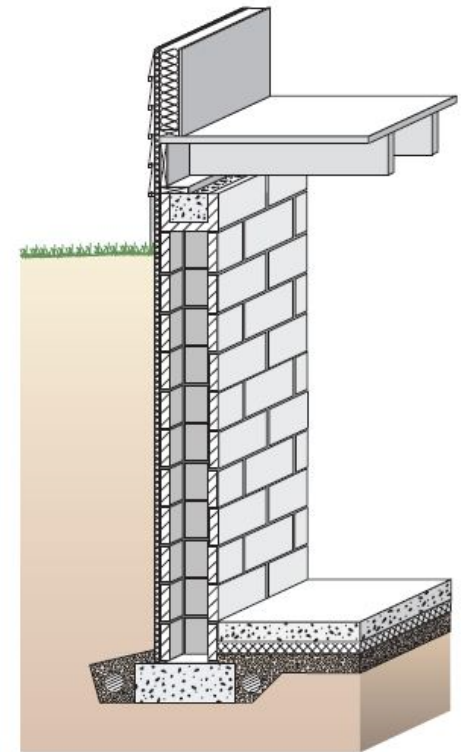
Concrete Masonry Basement Wall with Exterior Insulation
